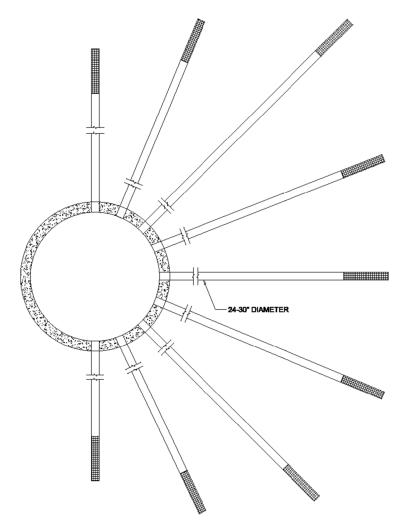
Plan View of a Typical Radial Collector Well System (FPL 2014-TN4058)
